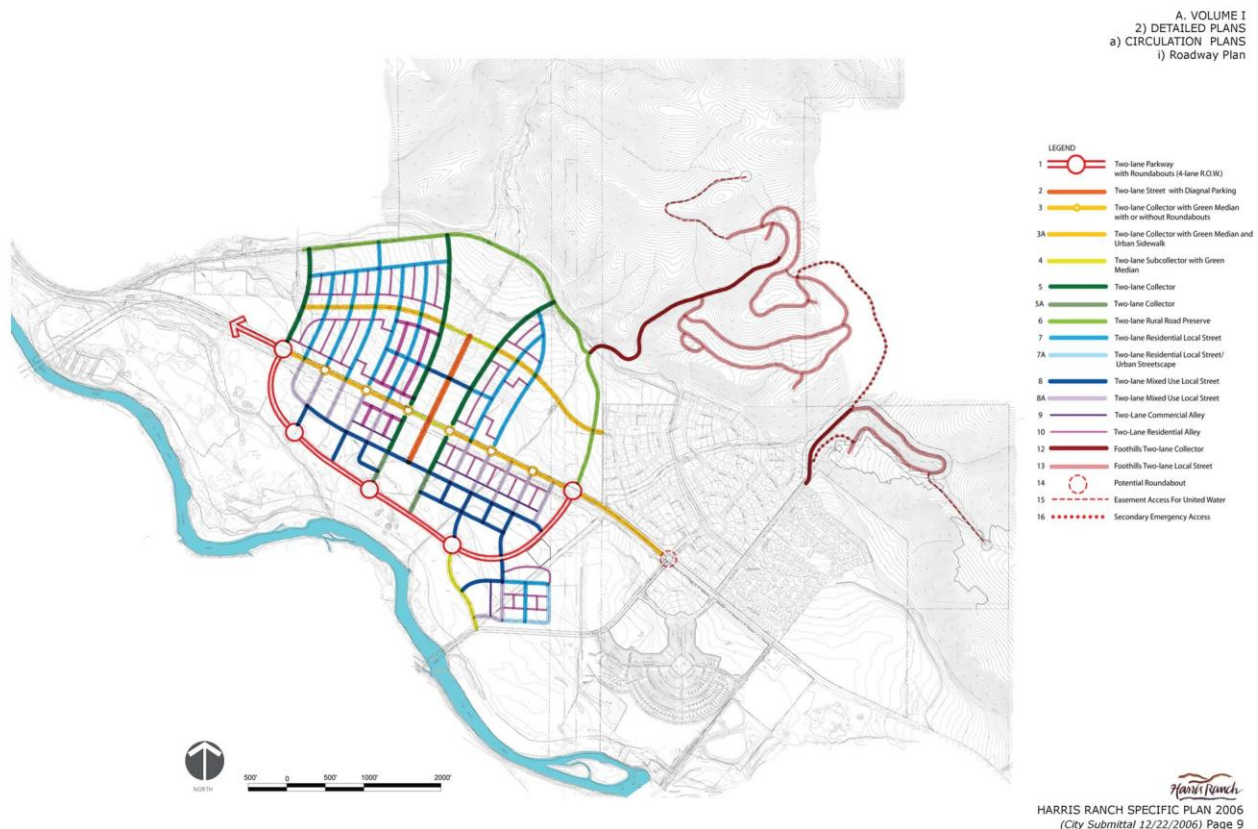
Round-a-bouts at Harris Ranch (Harris Ranch Specific Plan 2006).
